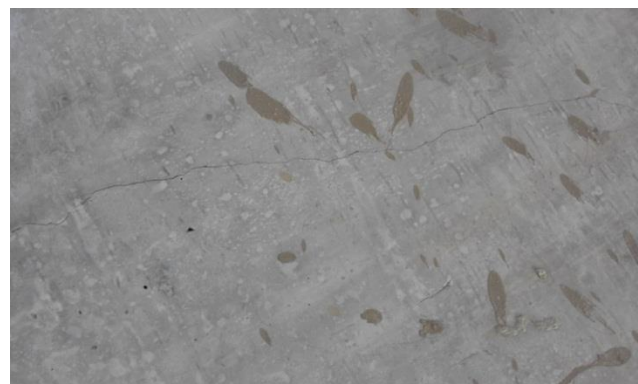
Photographs shows Crack, spalling and honey comb on Ayat terminal station bridge
